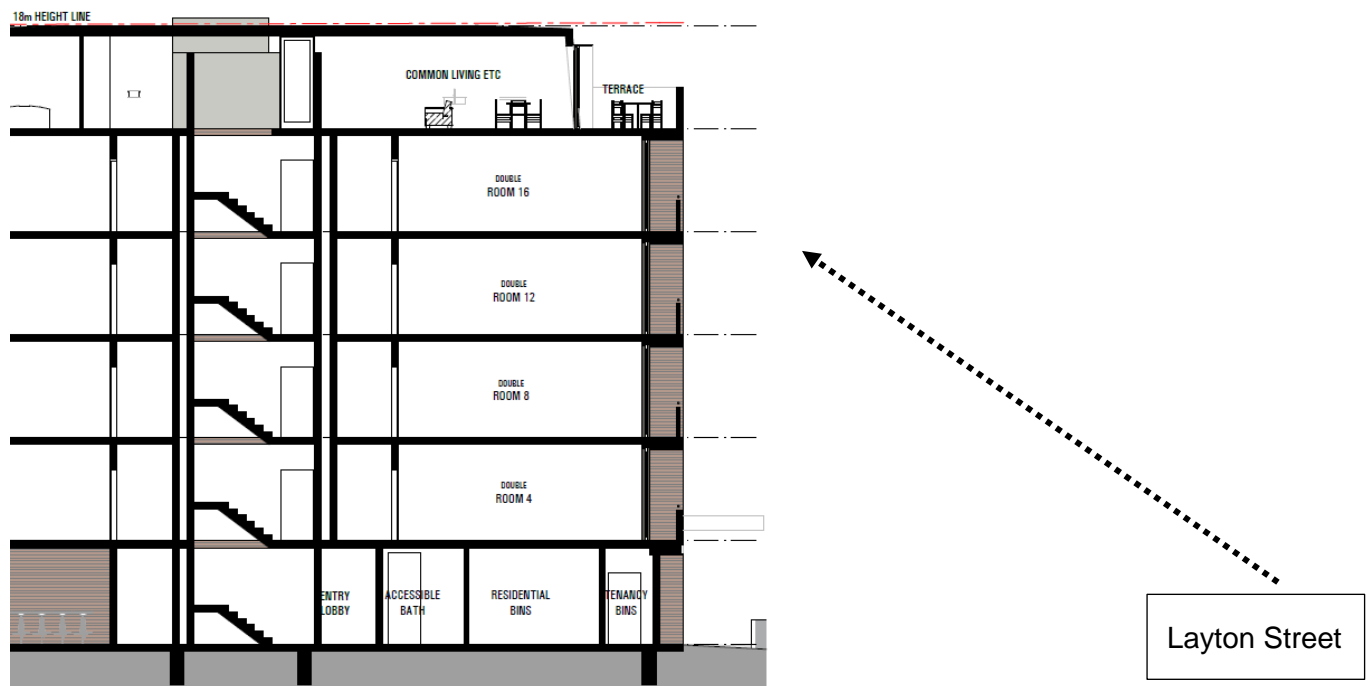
Sight line from Layton Street. The sixth level is setback from the street frontage and will not be visible from the public domain.
